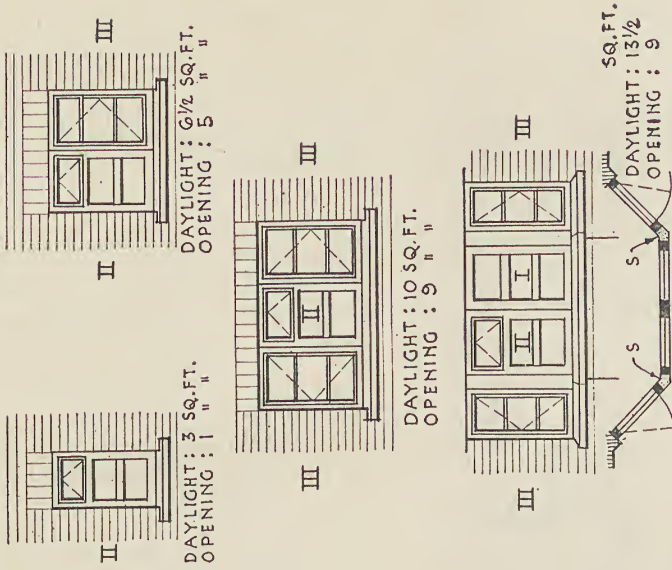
TYPICAL ASSEMBLIES OF CONCRETE WINDOW FRAMES IN WALLS OF CONCRETE BRICKS (OR BLOCKS).
